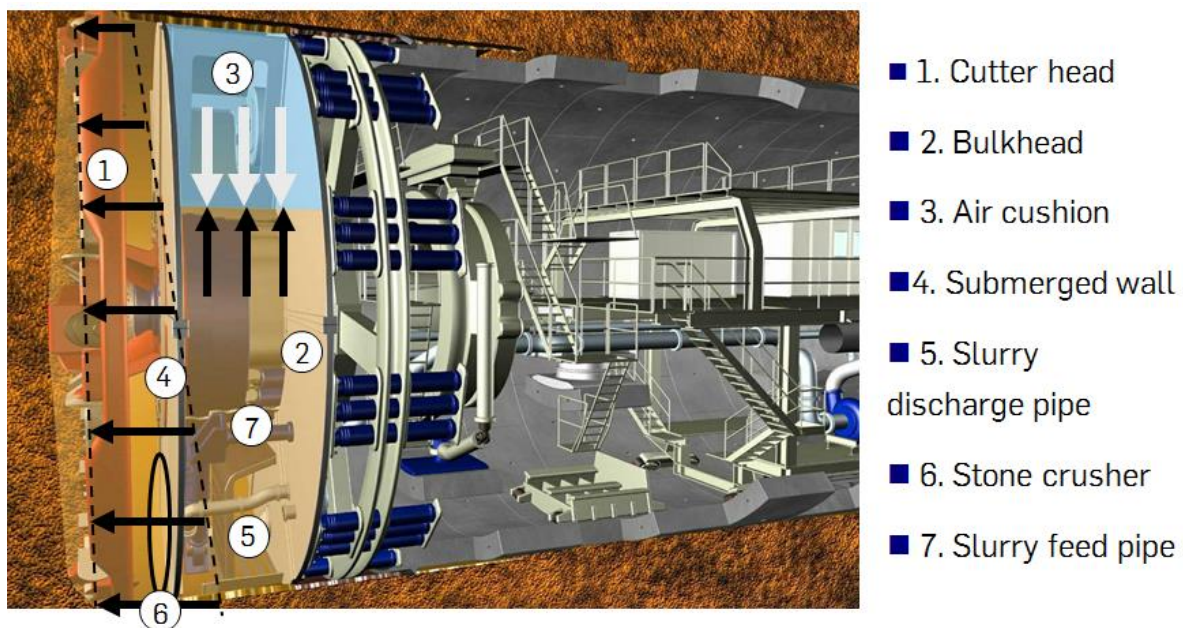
Longitudinal cut through Slurry shield machine (Herrenknecht AG)
